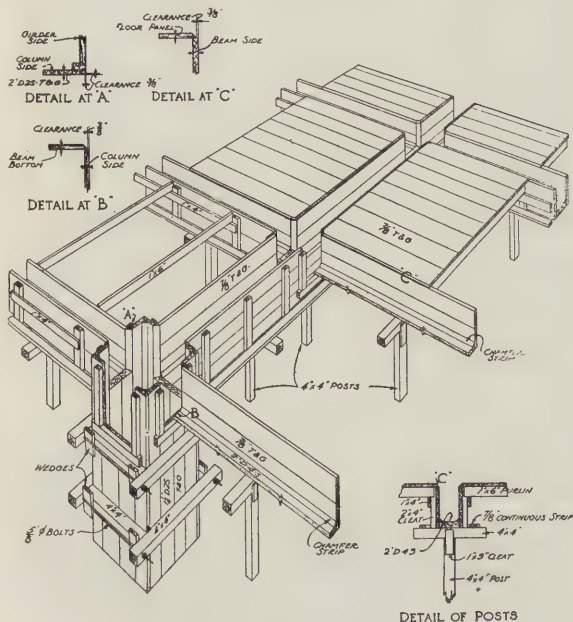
Beam and girder construction—Slab, beam and girder forms—for use when girder and beam bottoms remain in place on shoring posts, after sides are removed.
